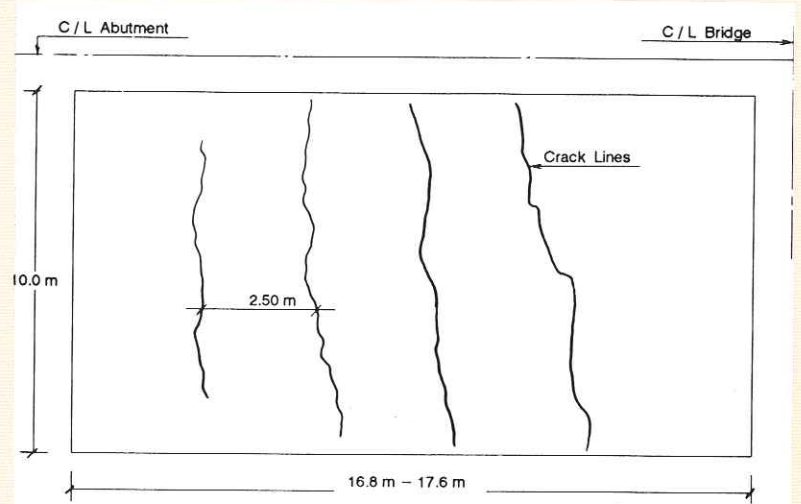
APPROACH SLAB AT STRUCTURE 13 - 2 (SOUTH)
